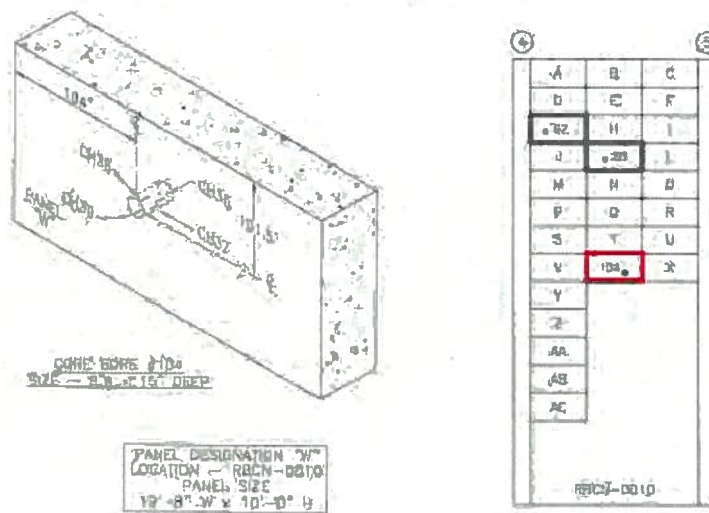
Detectors #36 to #39 in bore hole 104 and the location of bore hole 30.
